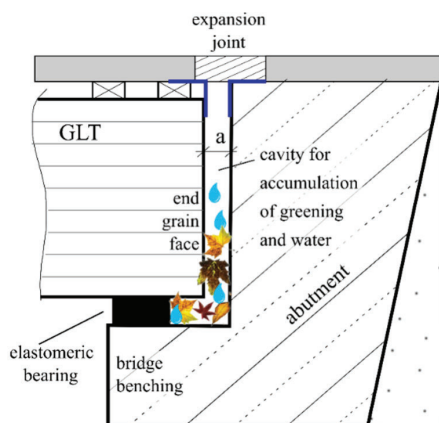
Frequent damage / decay prone detail of superstructure – abutment transition of bridges with sliding end supports where the narrow cavity between GLT end grain face and abutment wall is subject to accumulation of greenery and water
